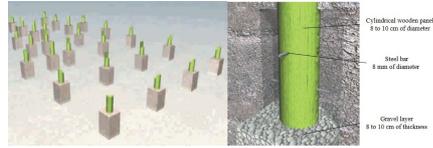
(a) Wooden piles distribution in a timber house covered with concrete, and (b) wooden pile detail with steel bars for adherence with concrete covering and gravel layer in the bottom (Fritz, 2007).
